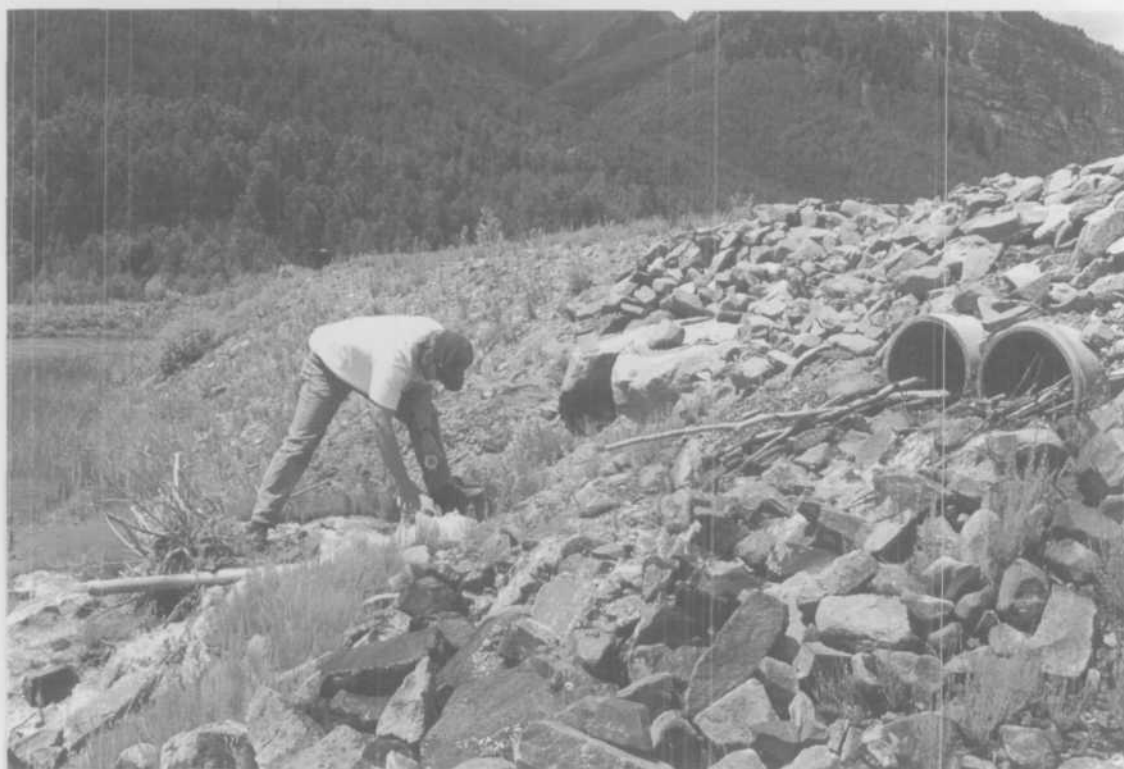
St. Louis settling Pond 18 Discharge (Site DR-4). Two additional culverts and a rock overflow spillway have recently been installed at the Pond 18 discharge.
